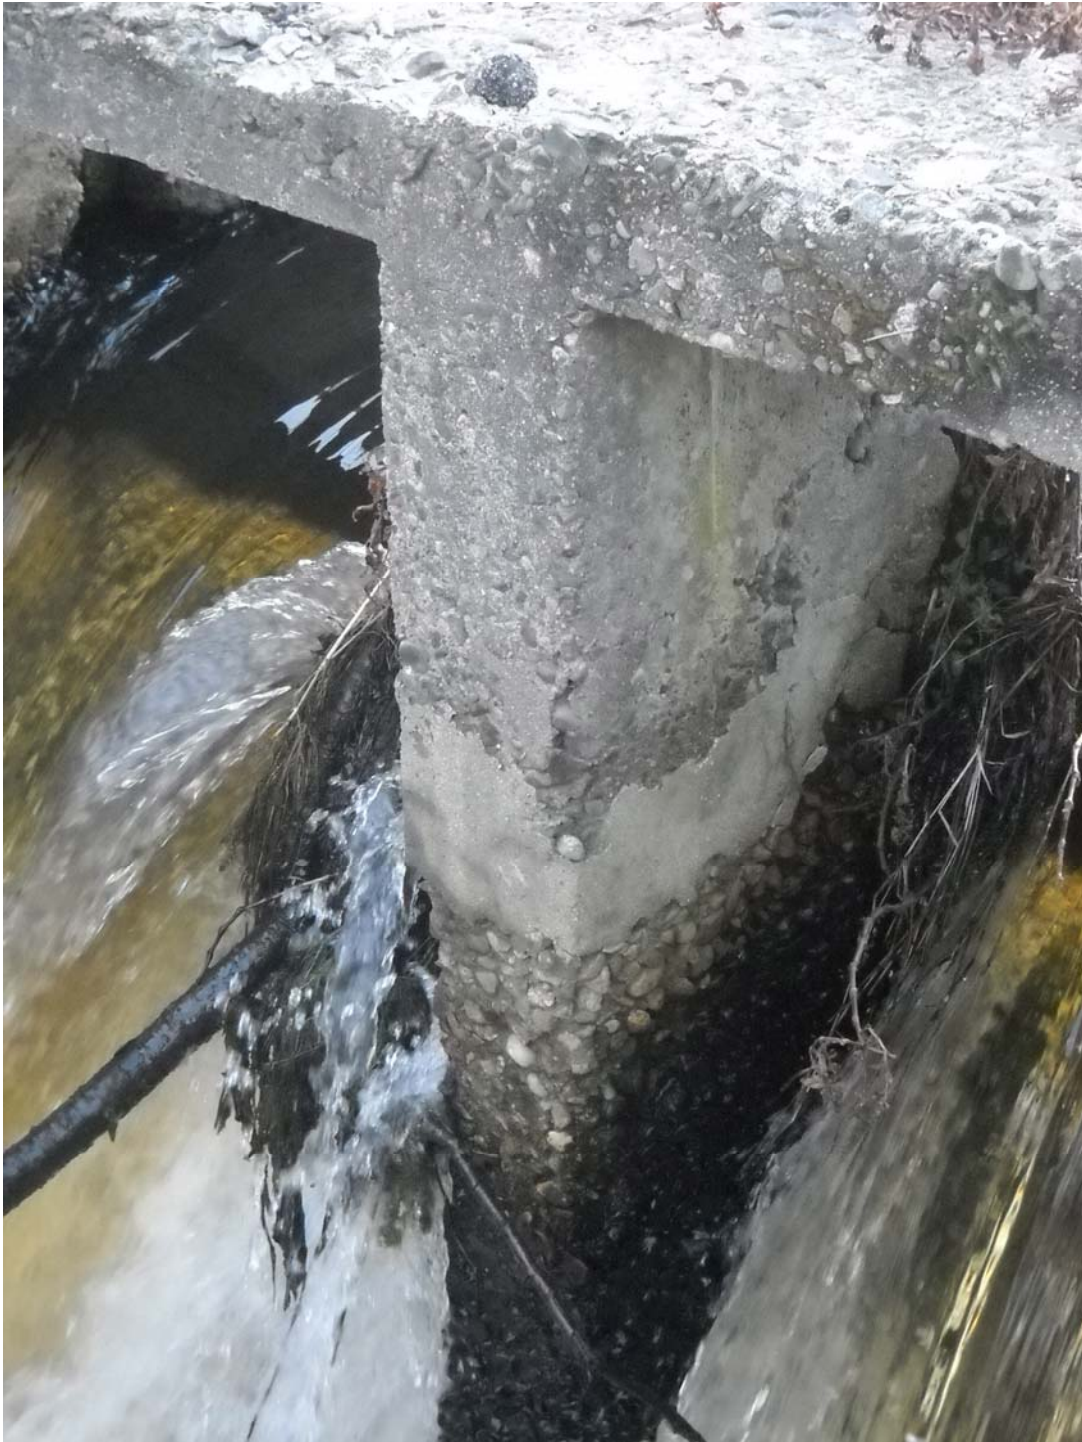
F – Exposed aggregate and deteriorated concrete at weir support column
